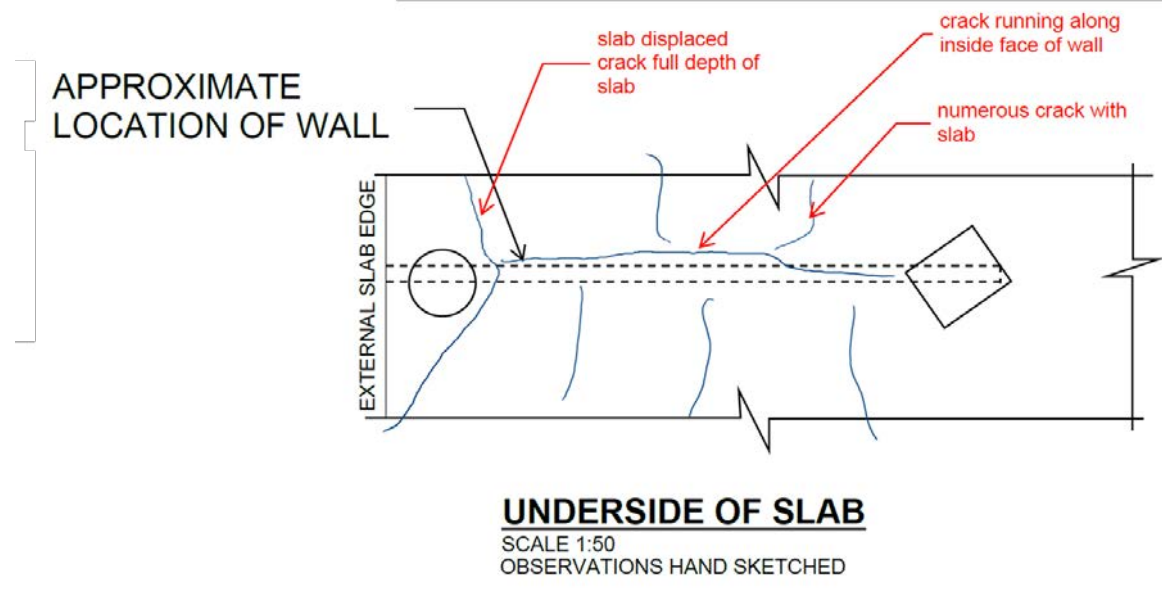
Drawing of the underside of Wall 10C-14.5 (Level 10 grid line C) documenting a splitting crack in the floor slab between columns C21 and at C38.
